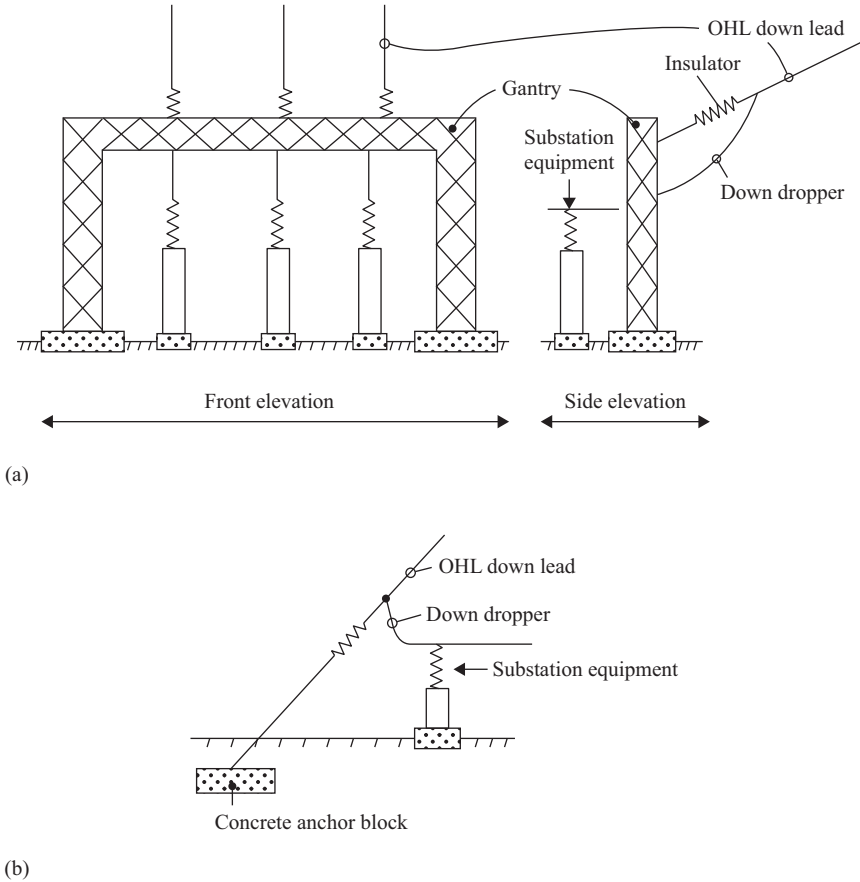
Substation gantry and anchor block arrangement: (a) OHL gantry arrangement and (b) 'anchor block' arrangement
